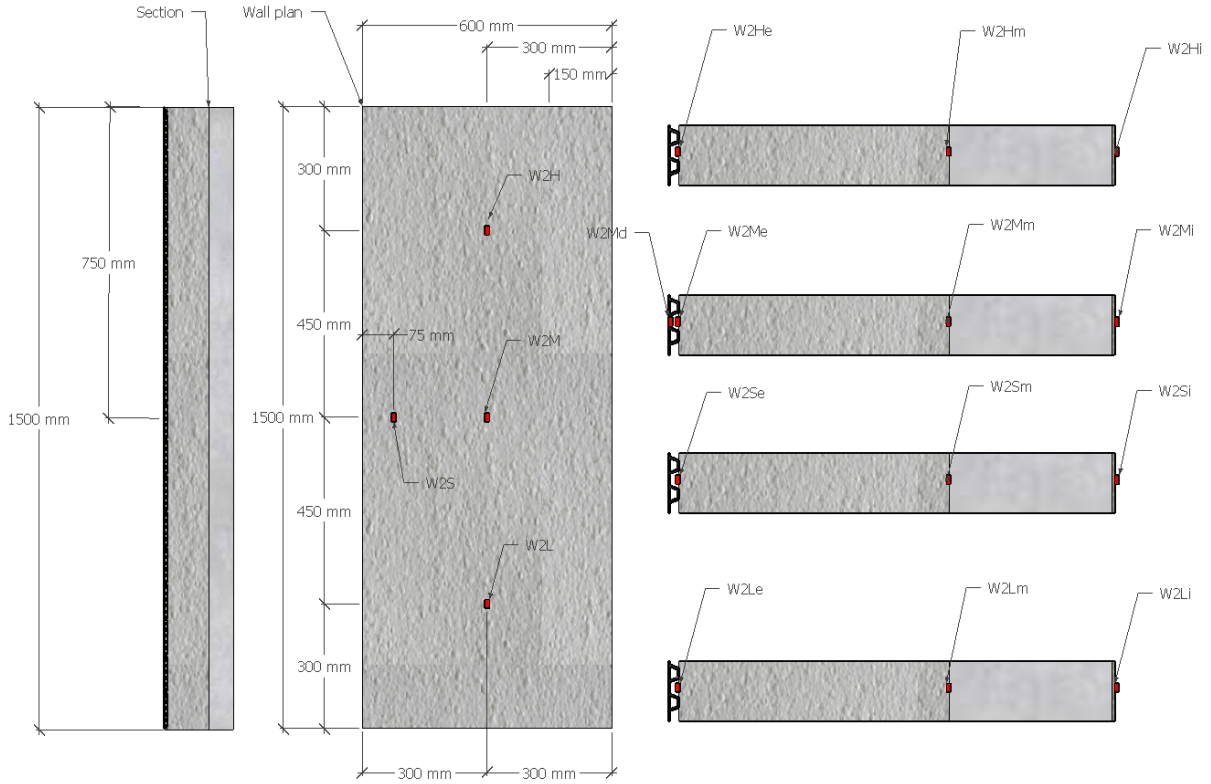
Diagram of thermocouple placement in the semi-permeable wall indicated in red. The sketch in the middle shows the front view of the wall segment from the exterior side. The sketches at the right and left show the cross-section of the wall segment.
